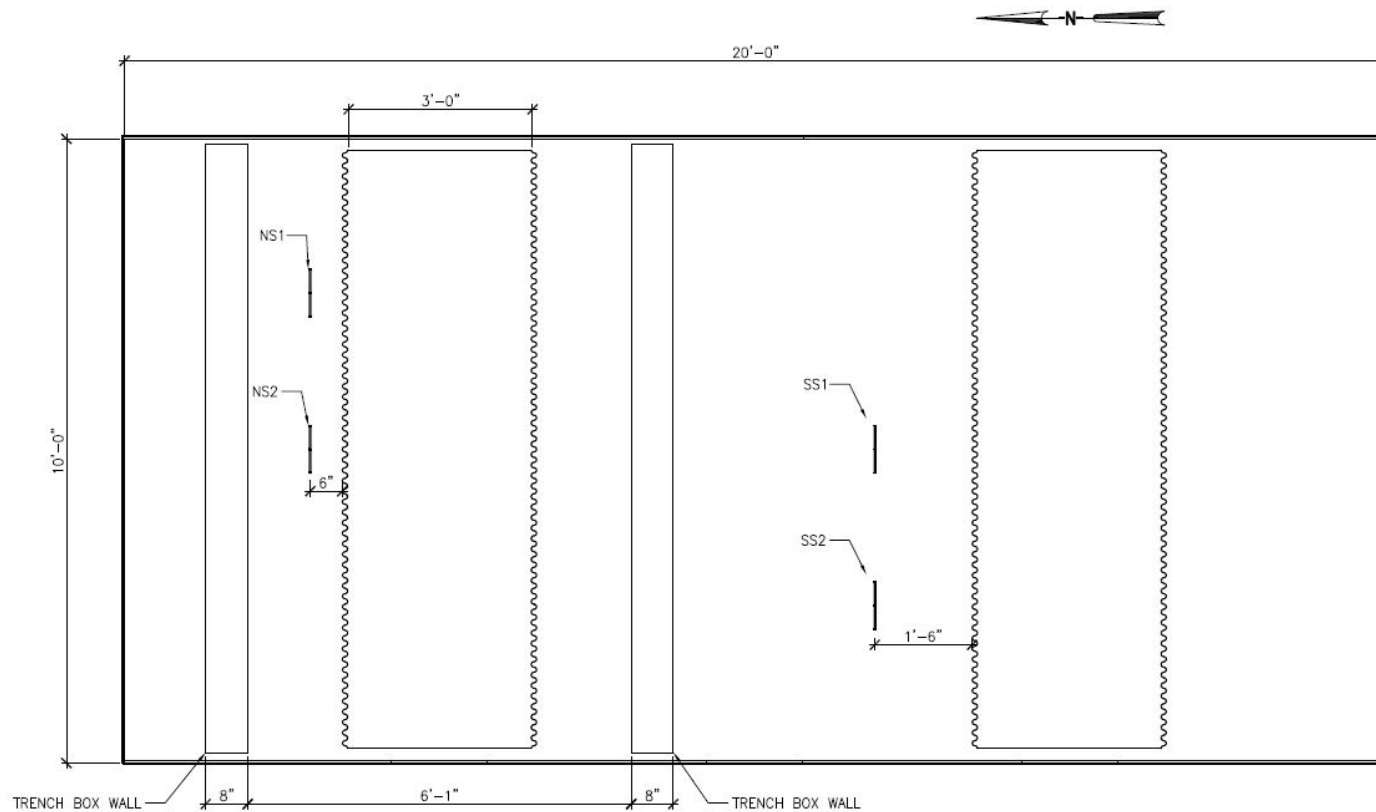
Earth pressure cell layout for trench box test one 4'-8" from bottom of Soil Box.
